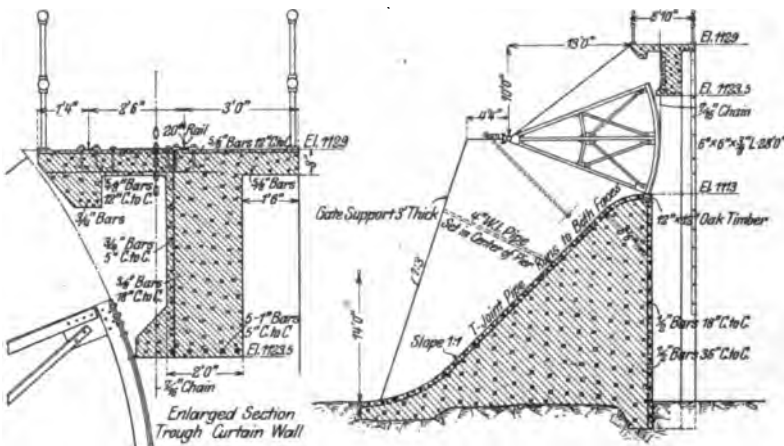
Spillway Section at Tainter Gate. High Falls Plant.
